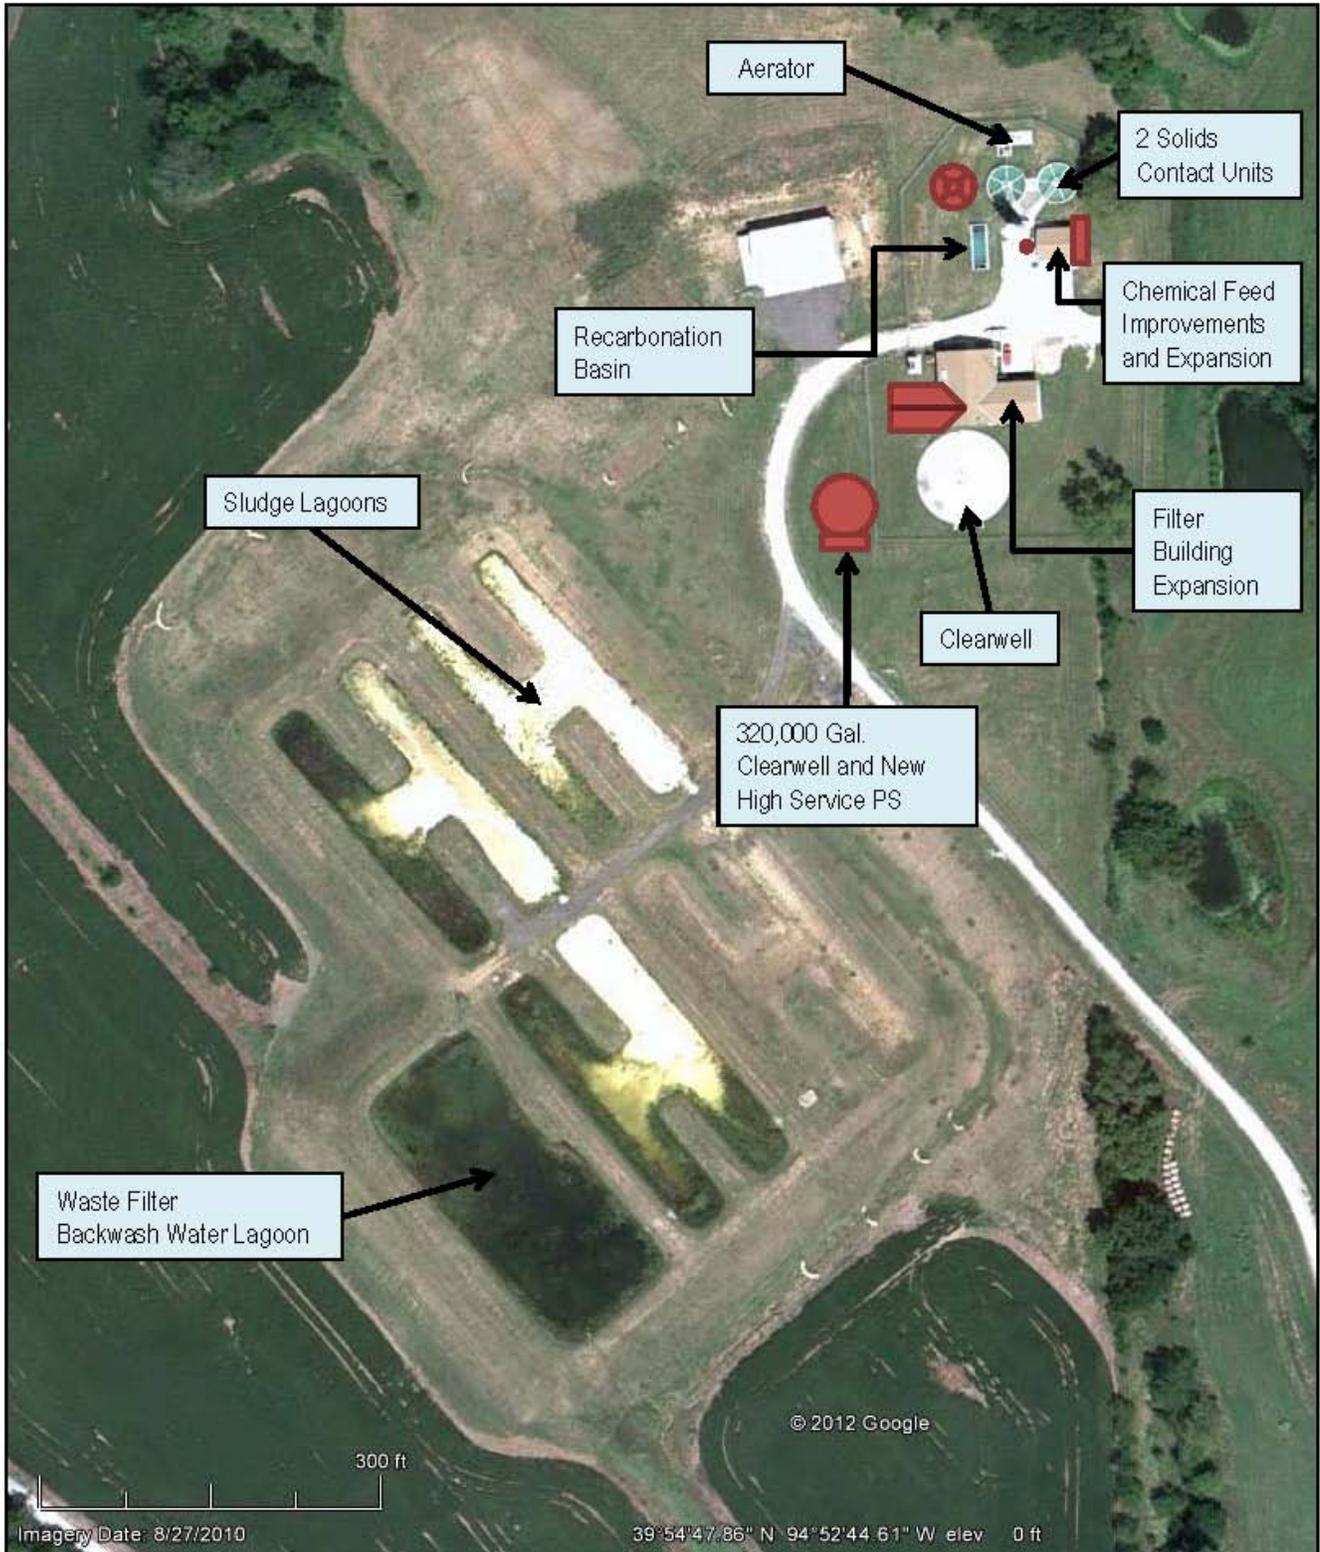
Savannah Water Treatment Plant Proposed Expansion
